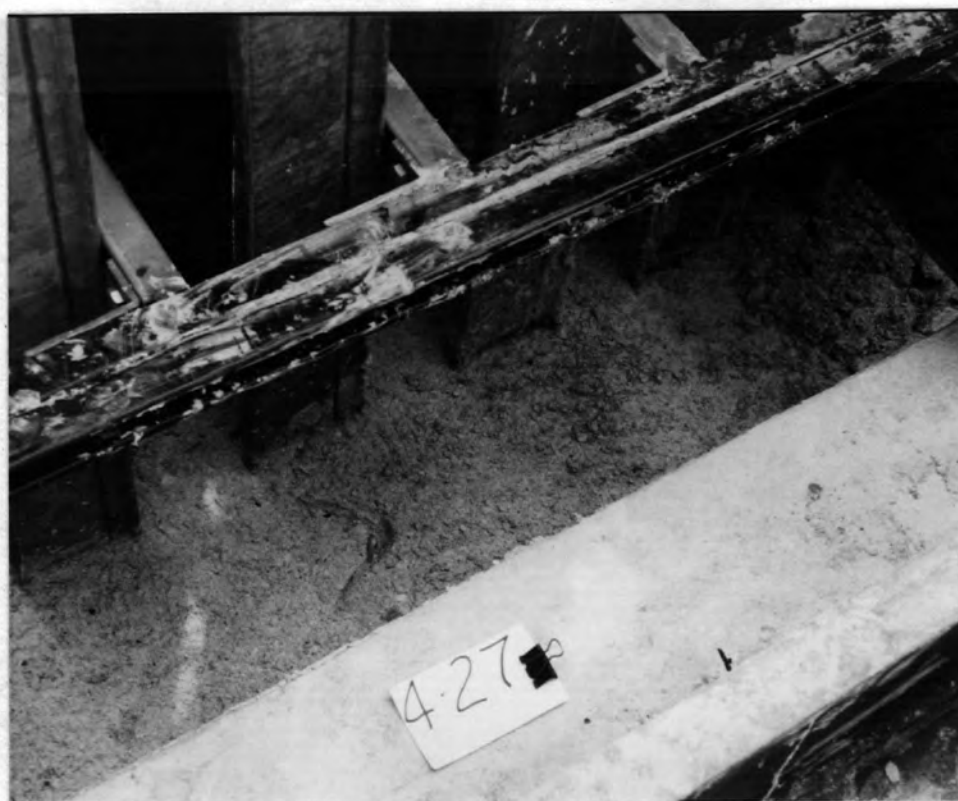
UNEXPOSED SURFACE OF SEAL
